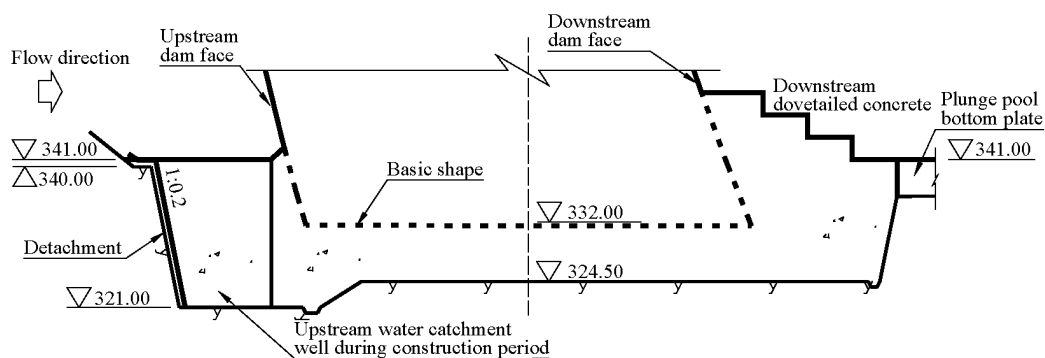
Cross section of the expanded integral structure of the foundation of Xiluodu arch dam (No. 15 cross joint profile) (unit: m)
